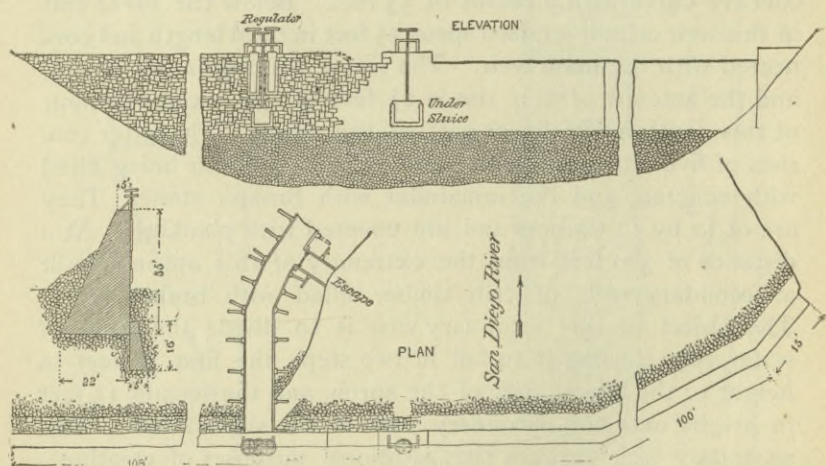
PLAN, ELEVATION, AND CROSS-SECTION OF SAN DIEGO WEIR.
